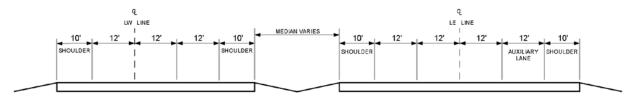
Typical Roadway Section with Auxiliary Lane
